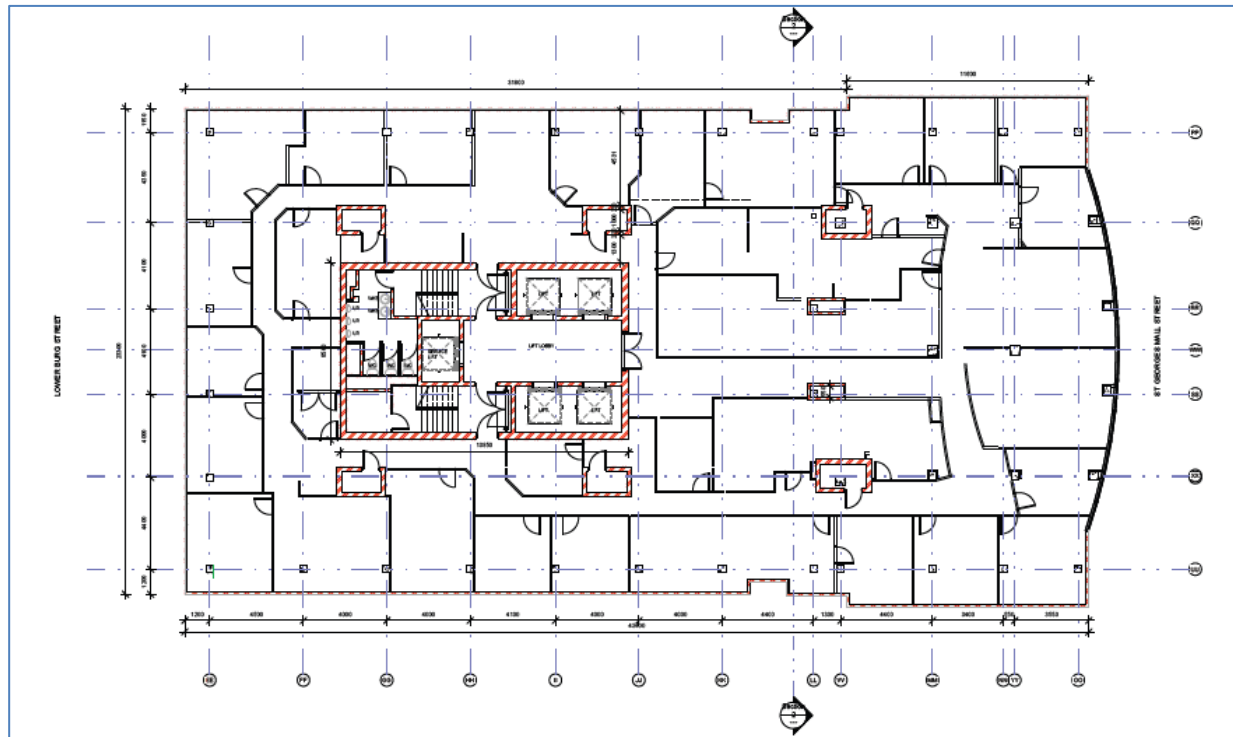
8th floor Thibault Square as-built space planning layout.
